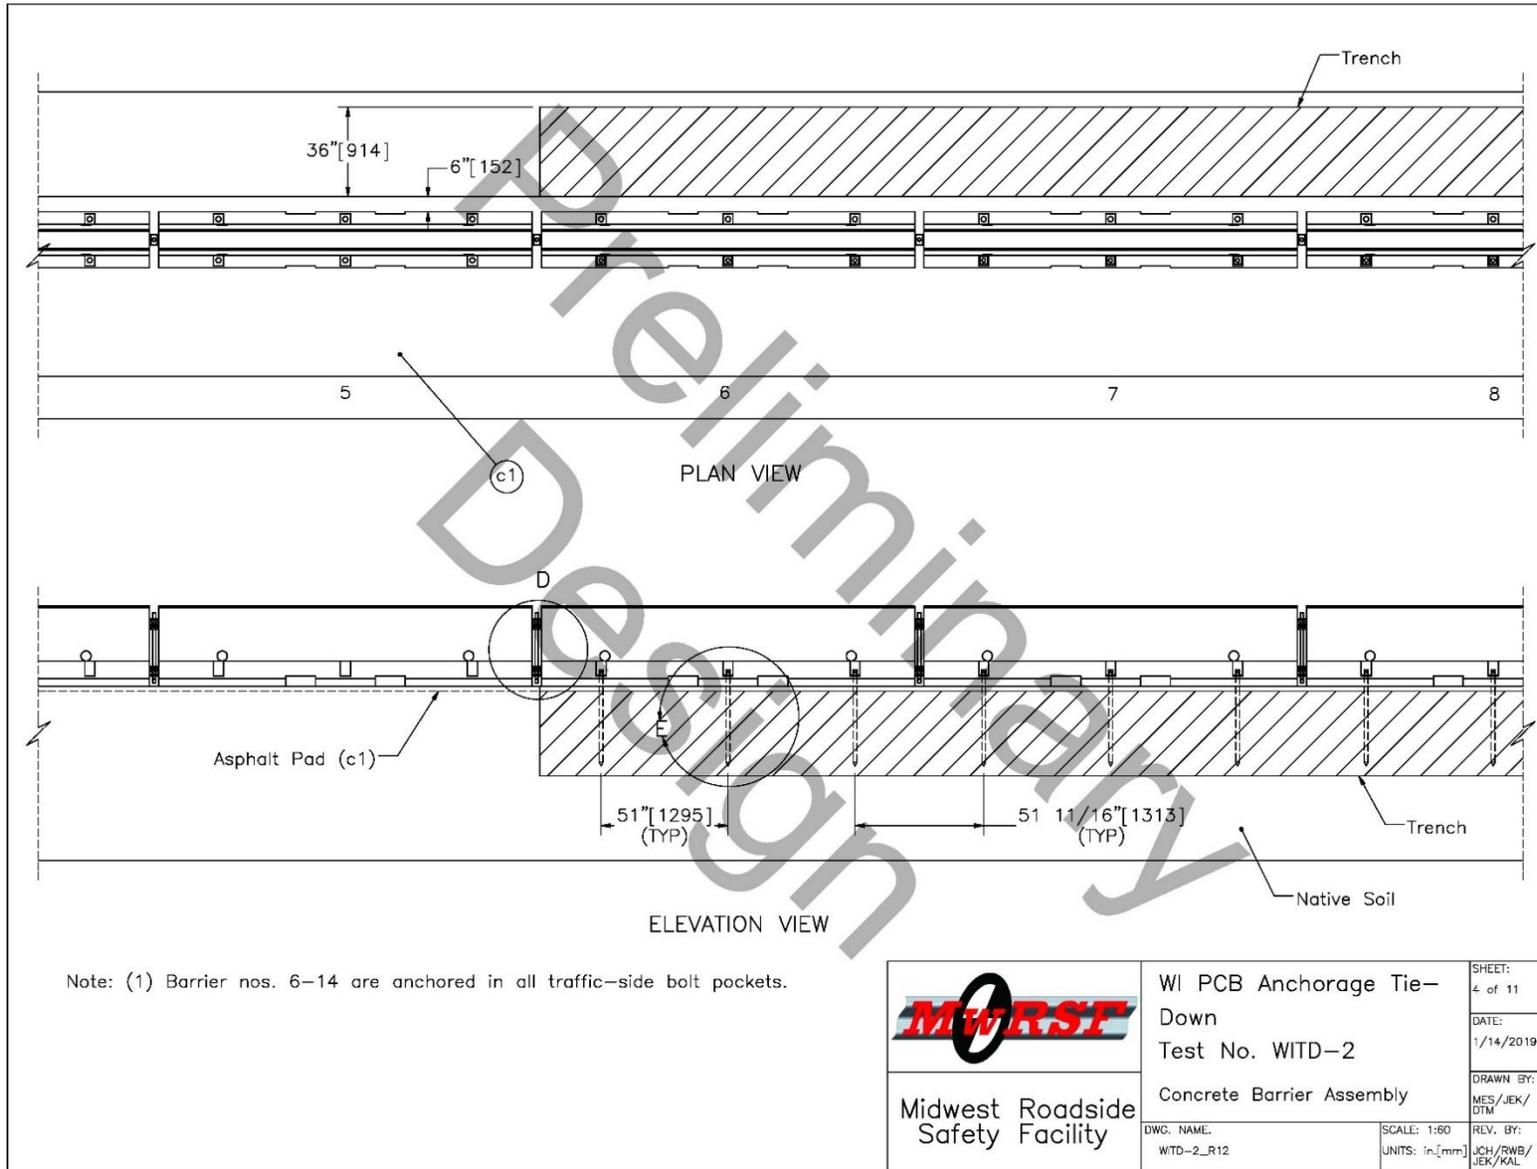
Concrete Barrier Assembly, Test No. WITD-2
